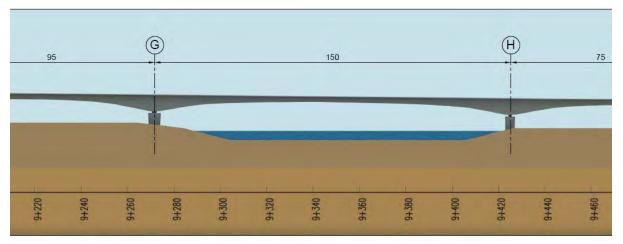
Section view of proposed bridge facing upstream with Dangan located on left side
